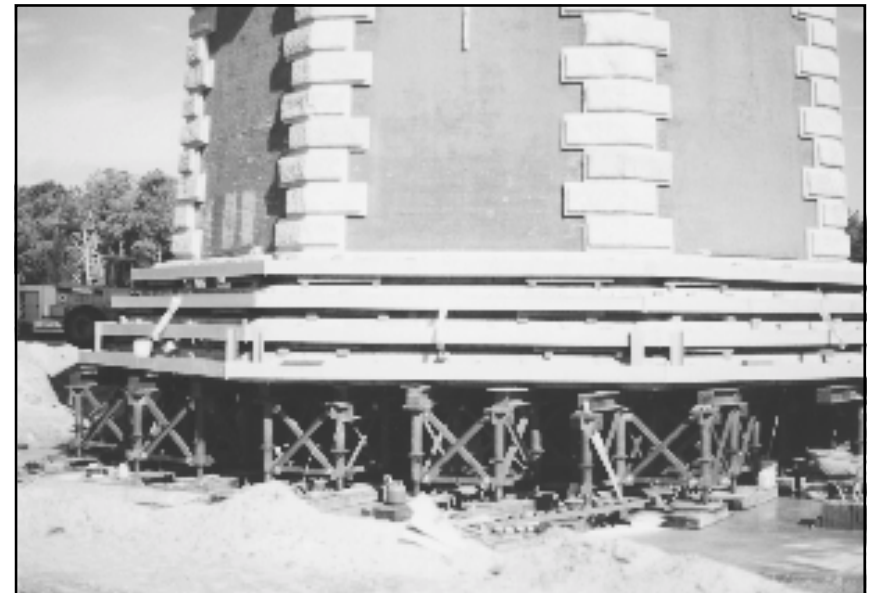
shows a view of one side of the lighthouse with its steel shoring towers. When enough of the foundation brick walls are installed to within one inch of the steel shoring towers to be supportive of the load, the shoring towers will be removed, but only after tests of the mortar prove that the strength is adequate to hold the load, which is about three days after the mortar has been set. Tests of the mortar strength are done frequently enough to assure that the walls can carry the load. When this state is reached, the steel shoring towers are removed, and the balance of the openings are filled with additional brick walls. The spaces between the shoring towers and the brick walls are filled with mortar before the final lowering process is done.
